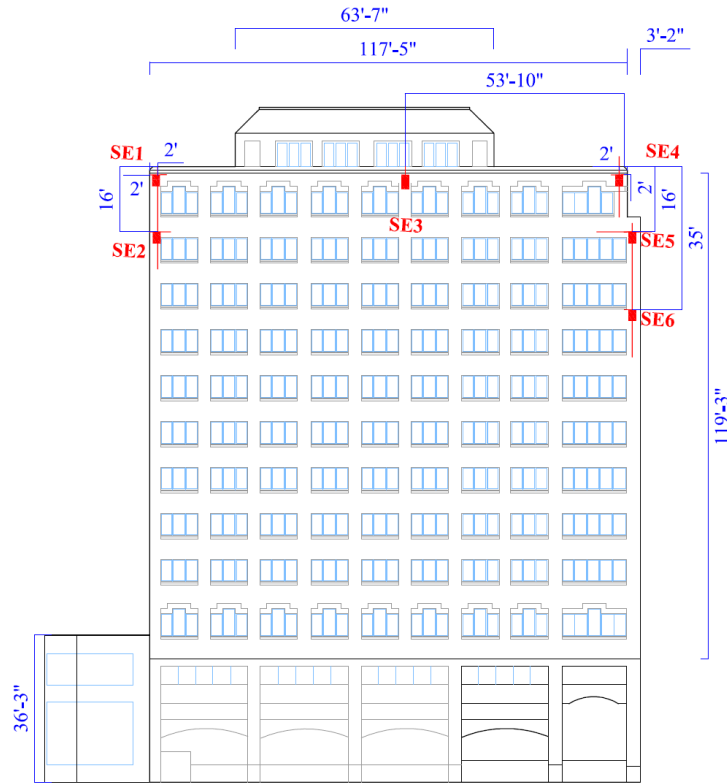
South-east elevation of FB Building with driving rain gauge locations
